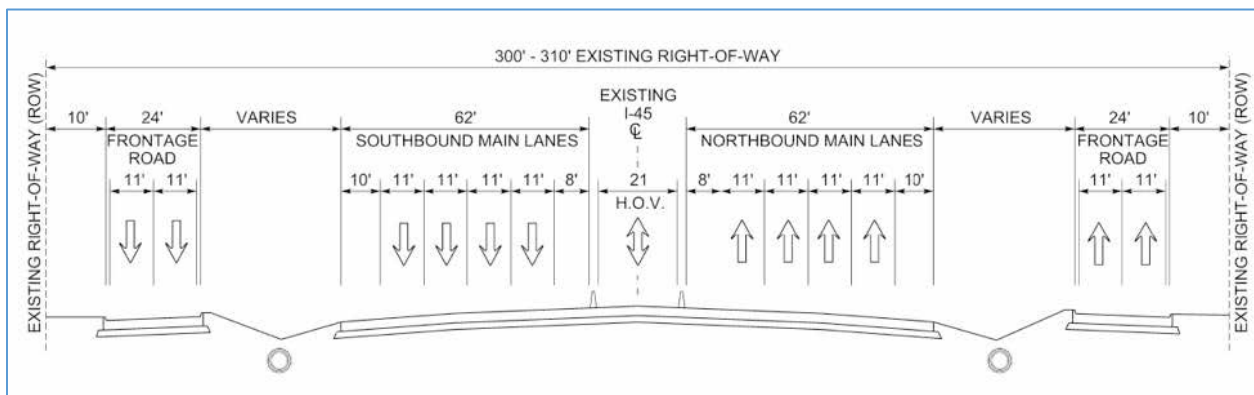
Existing Typical Section from South of Shepherd Drive to South of West Road
